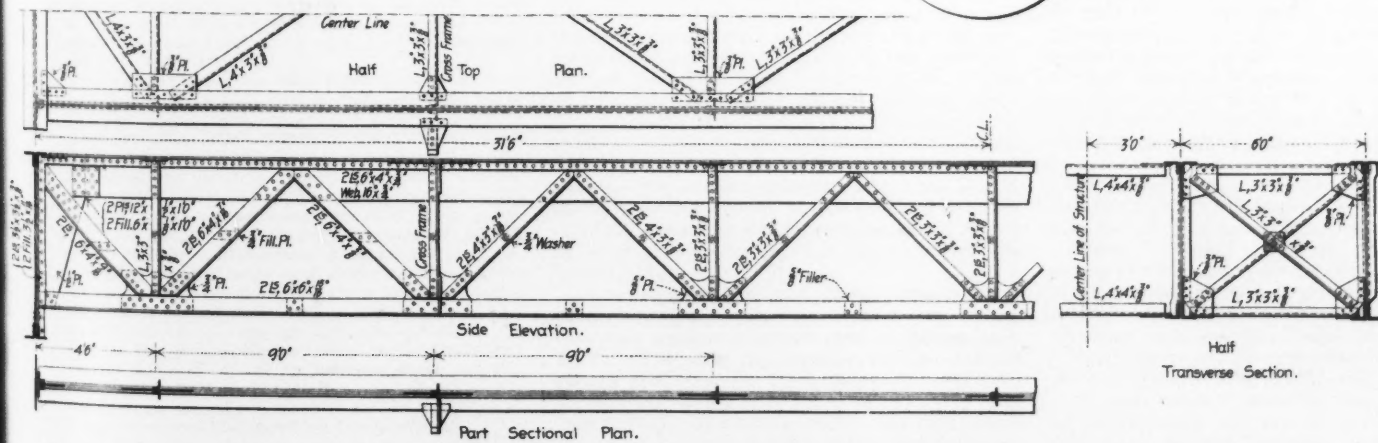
STANDARD LONGITUDINAL DECK GIRDER CONSTRUCTION.
